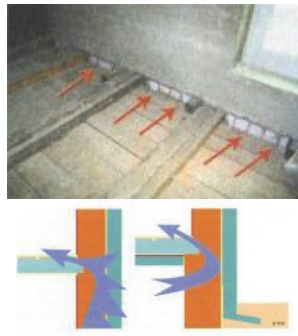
Problematic area in an airtight layer on the inside : the wooden beam ceiling
